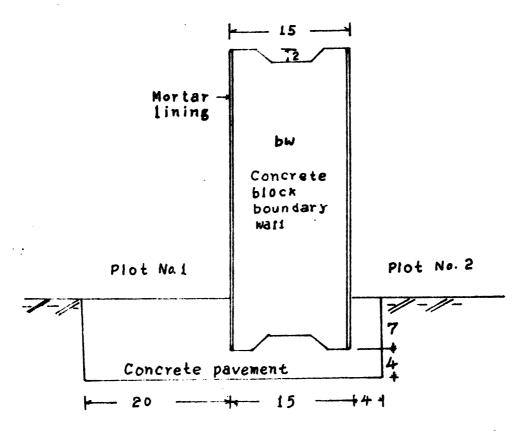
Cross section of boundary wall and pavement (unit: cm)
